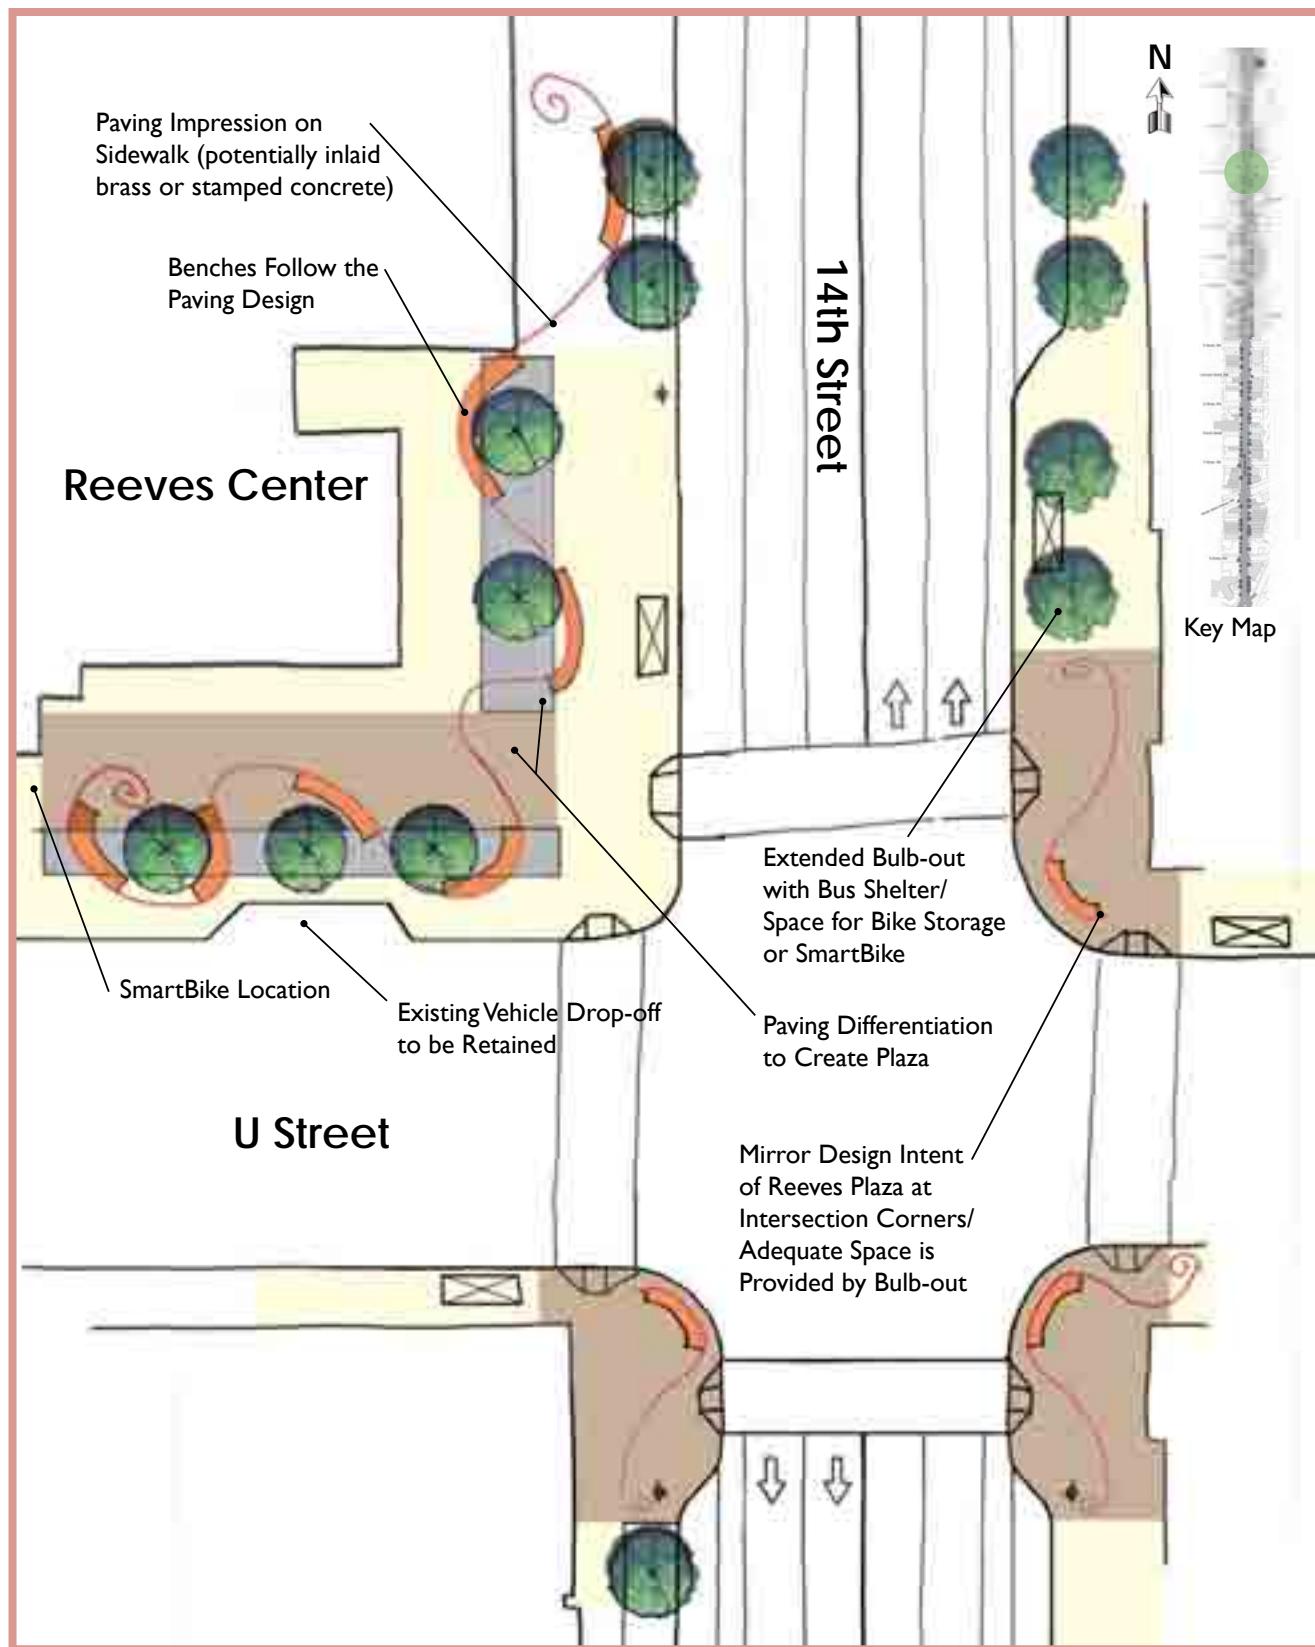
Conceptual U Street & 14th Street NW Plan
